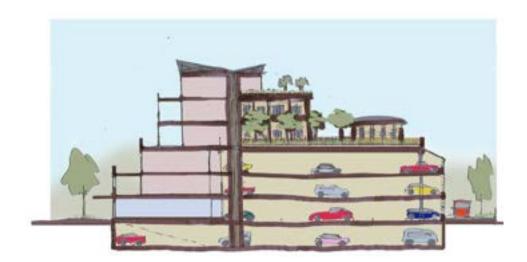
Landscaping and open space on upper level setbacks and roof space are encouraged.
